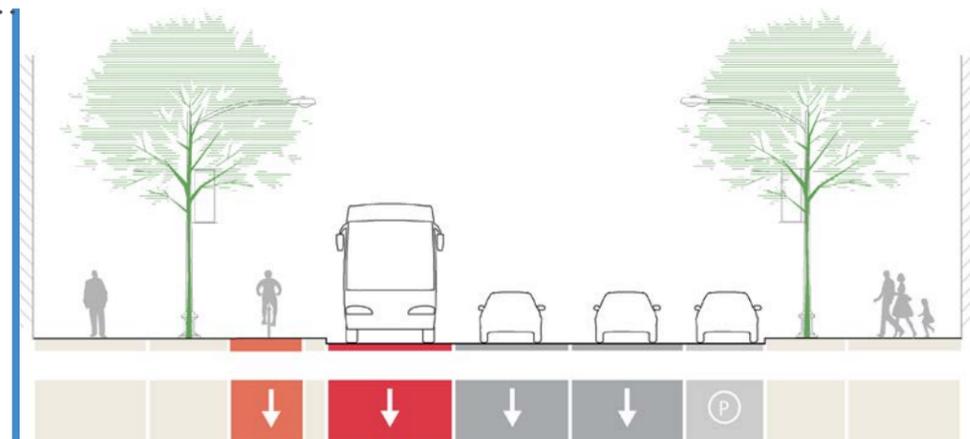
Fifth Street typical section Bowie Street to Guadalupe Street
